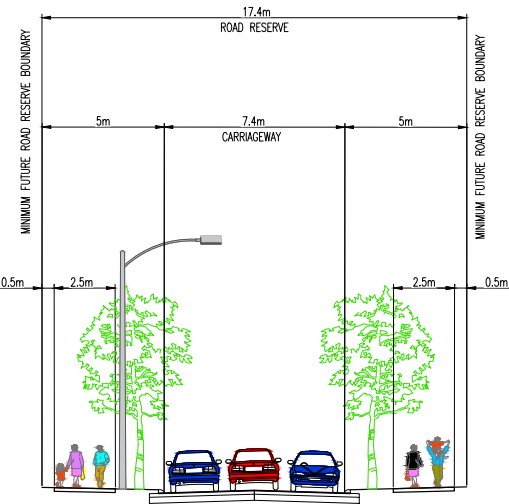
CROSS SECTION OF ACCESS STREETS C
